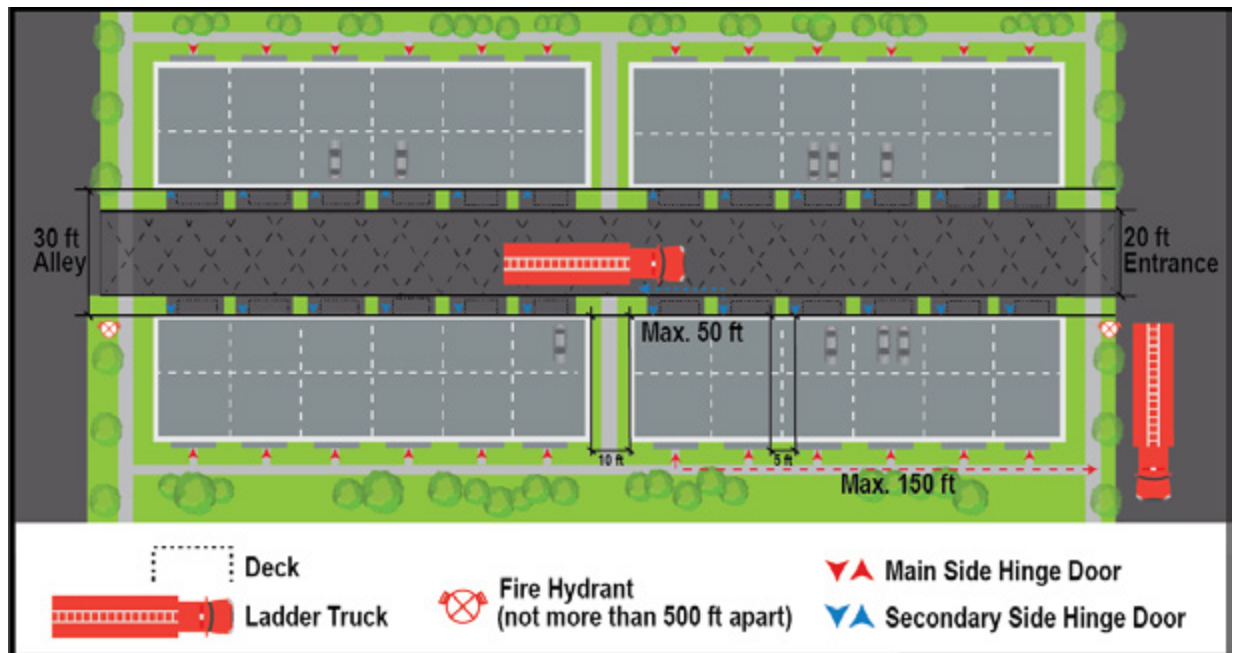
Plan of residential alleyway, showing a building-to-building distance of 30 feet.
